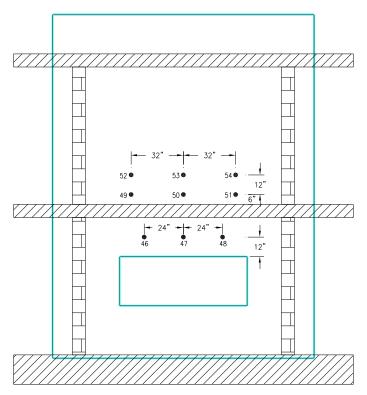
Instrumentation Arrangement (Interior Face of Wall Assembly on Second Floor Room and Burn Room).
